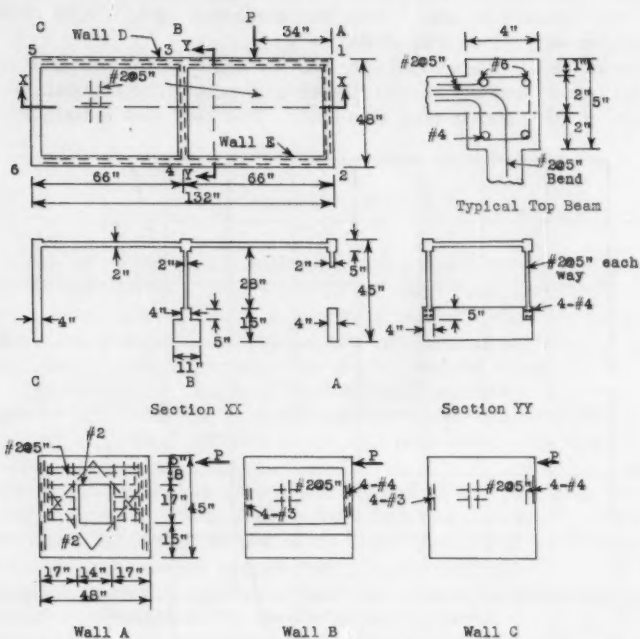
DETAILS OF SPECIMEN SD-7.
